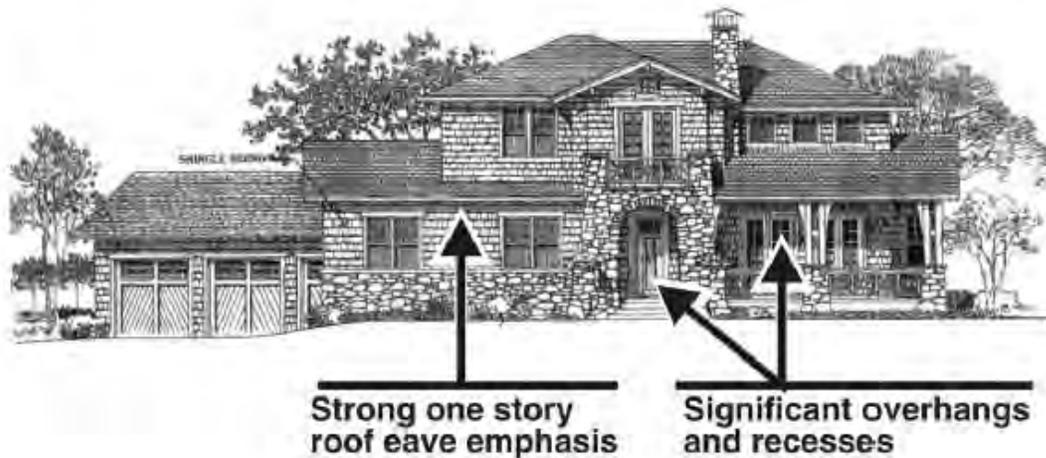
Second floor is pulled into the center of the roof providing a setback from the building edges helping to maintain adequate space, light and sense of openness to the adjacent residences.
